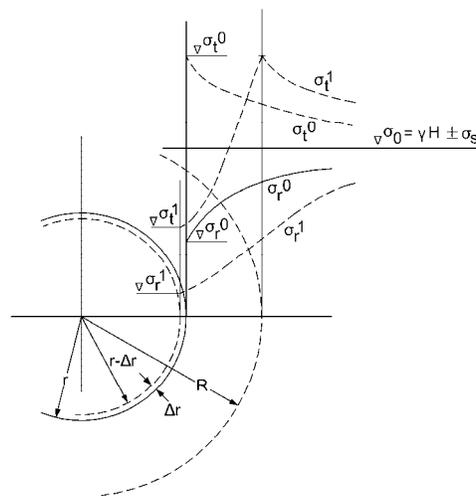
Schematic Representation of Stresses Around Tunnel Opening (Rabcewicz et al., 1973)
